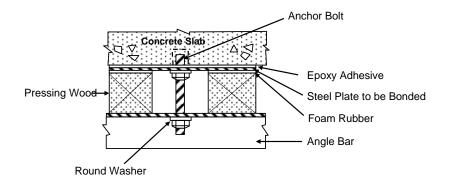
Detail of Pressure Attaching Method by Anchor Bolts
